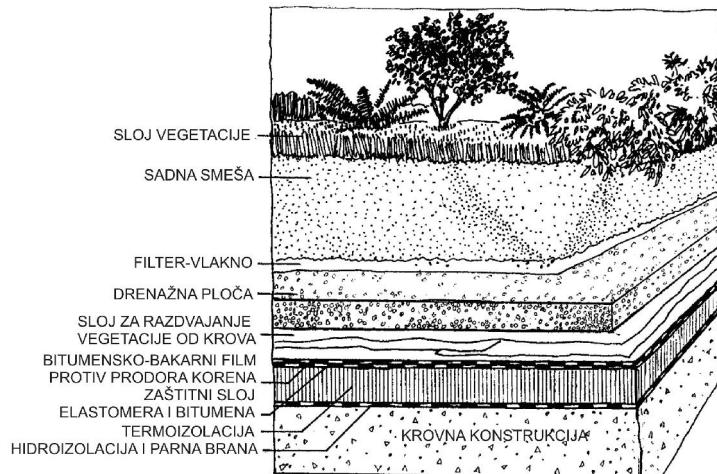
Cross section of the roof garden with irrigation components Floradrain
